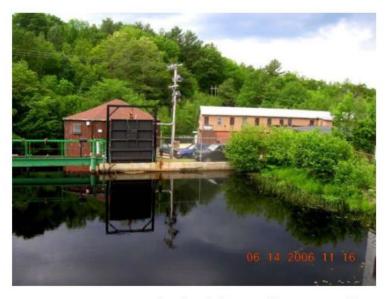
Walkway over the Dam& Marden Style Needle and Stop log section looking North.
